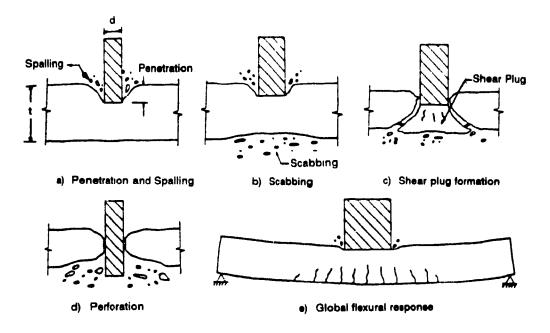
FORMS OF IMPACT DAMAGE75
